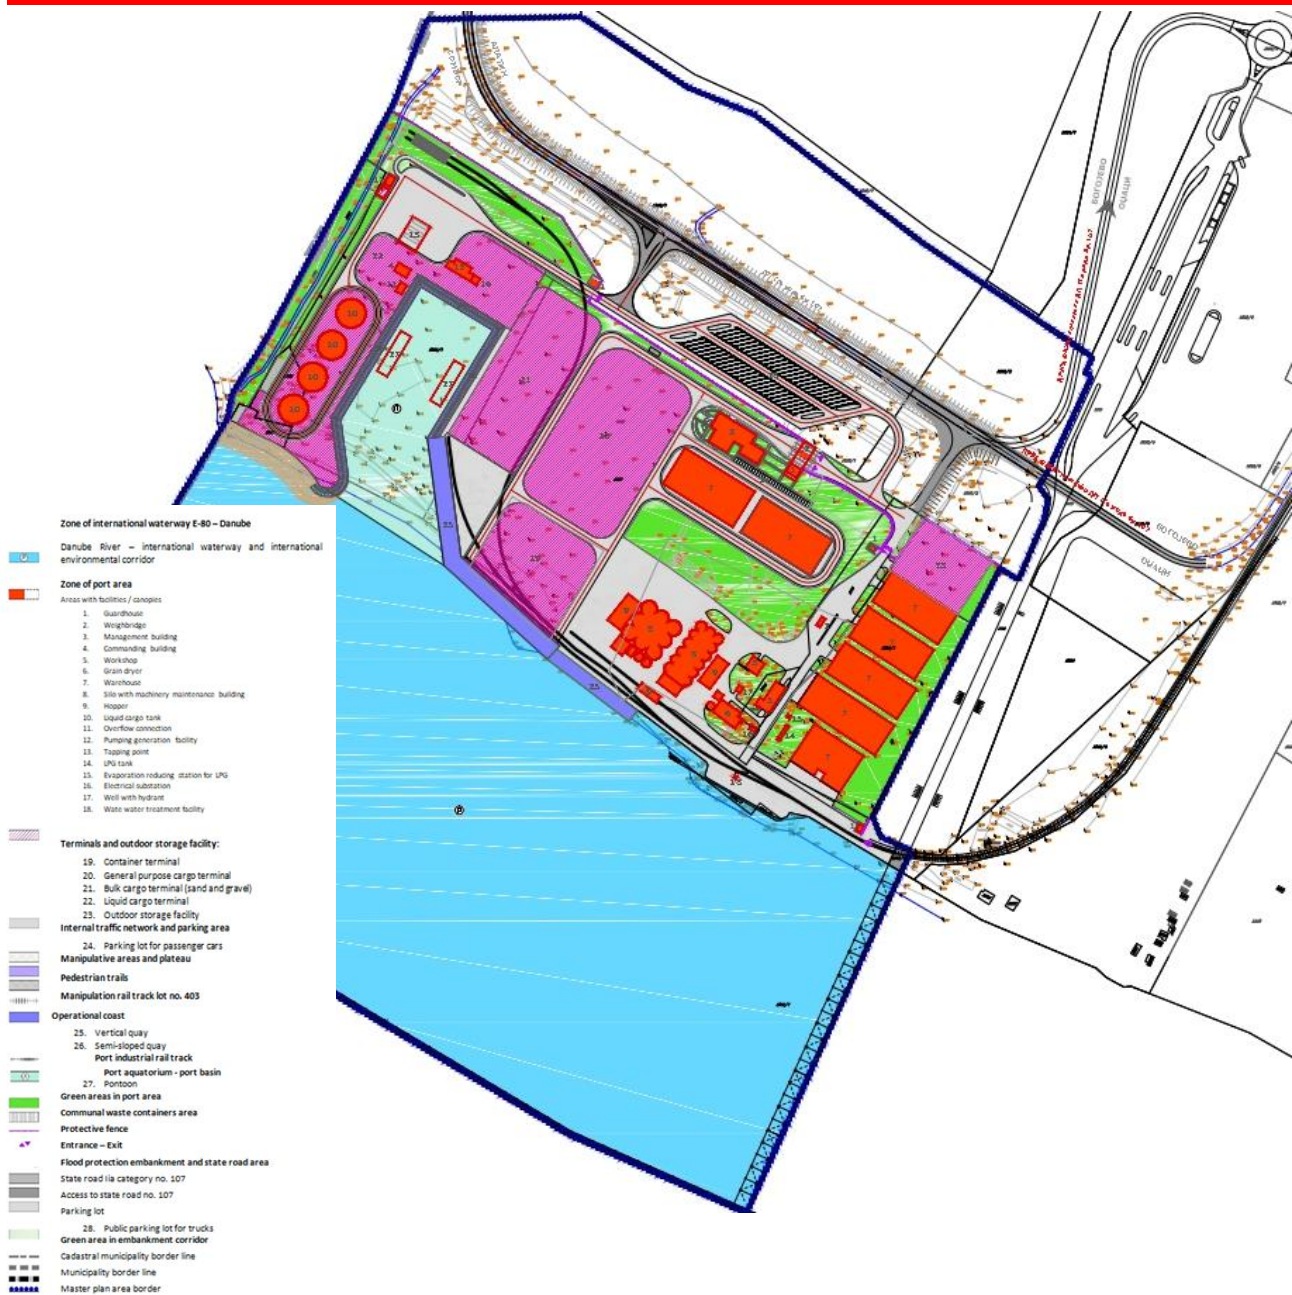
The detailed layout of facilities in designated area⁴⁴
